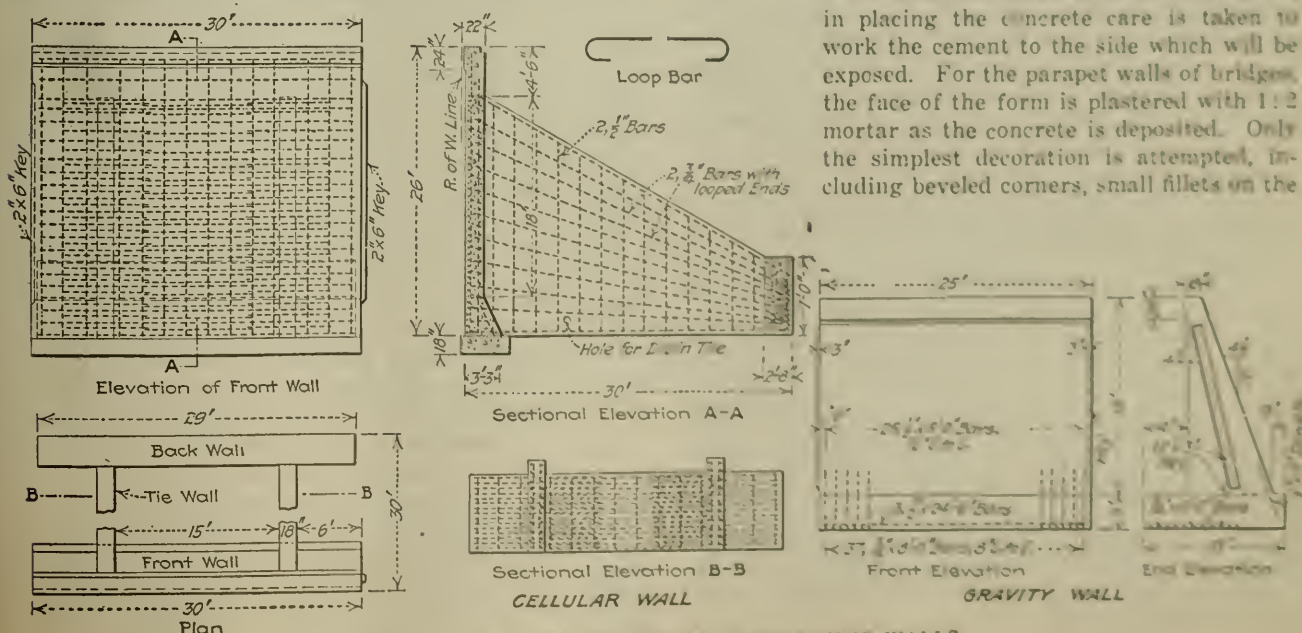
CELLULAR AND GRAVITY RETAINING WALLS
